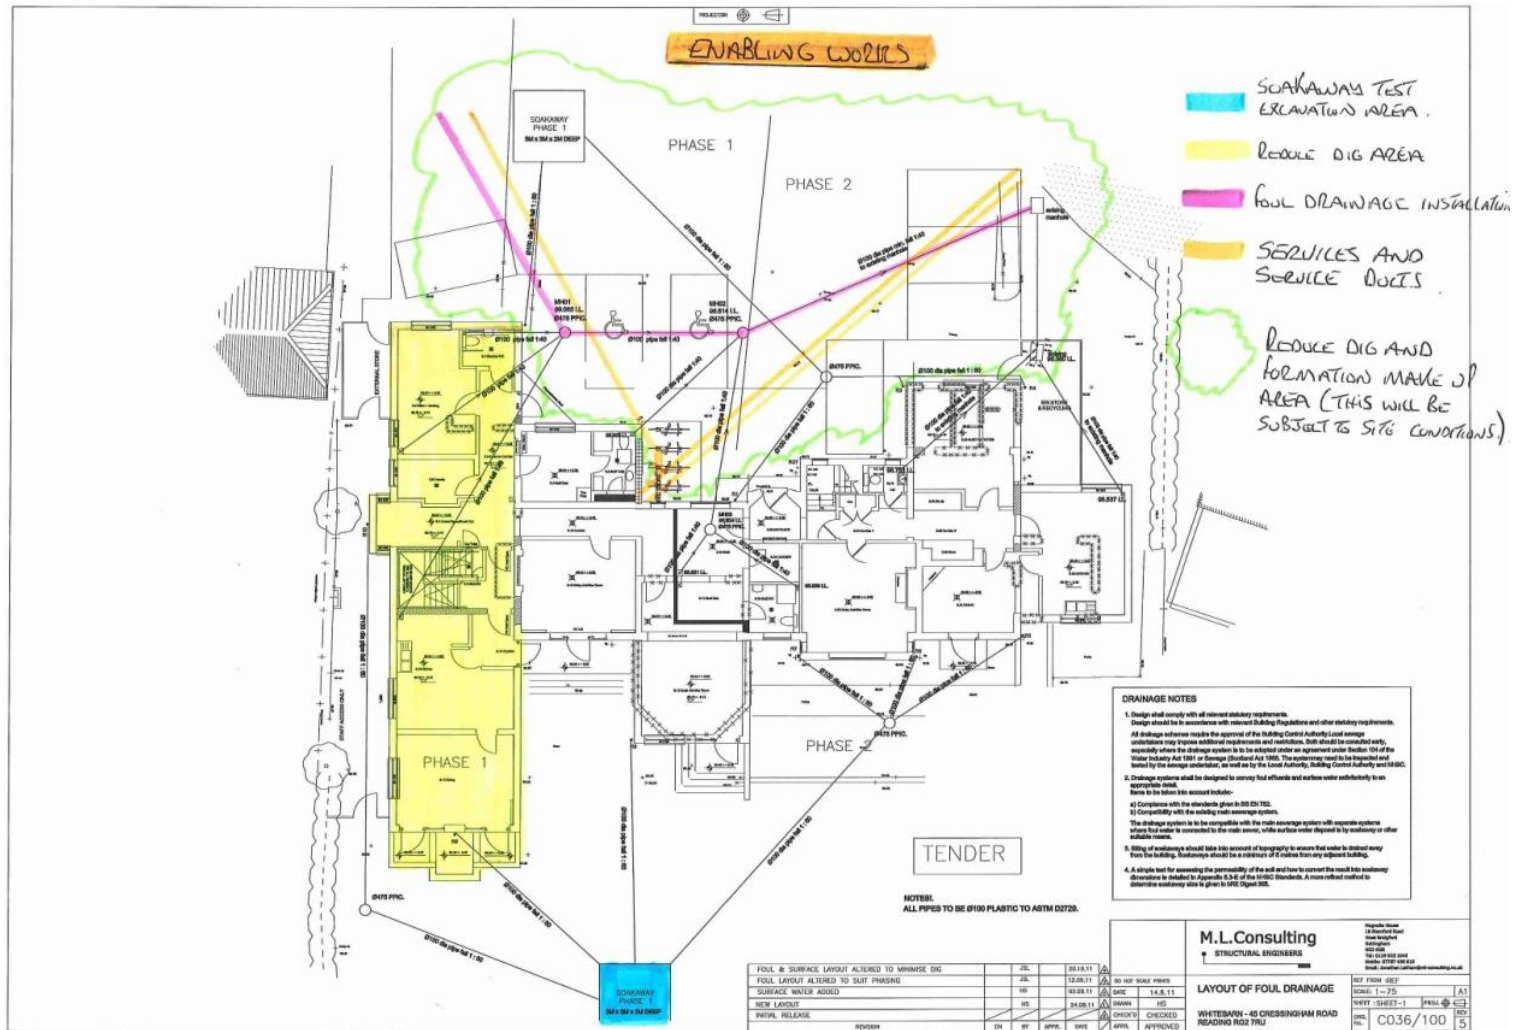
Proposed groundworks Plan supplied by developer. North to top of plan
